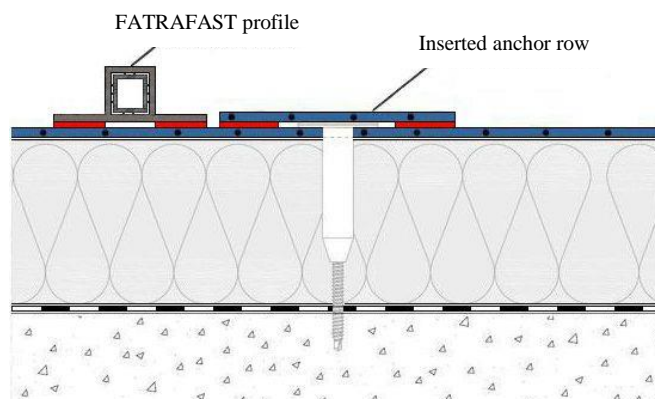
Installation of the FATRAFAST profile in the centre of the waterproofing sheet
